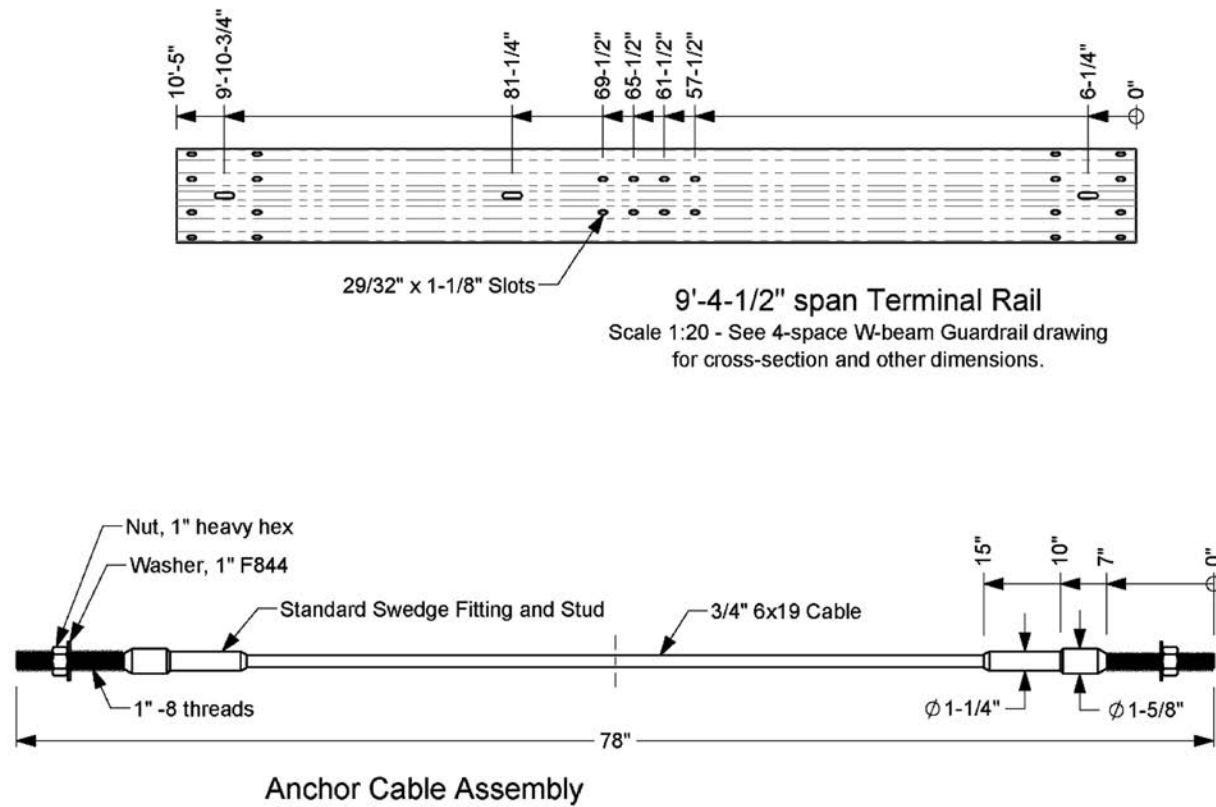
Tests 612941-02-1 and -2 additional terminal details.
